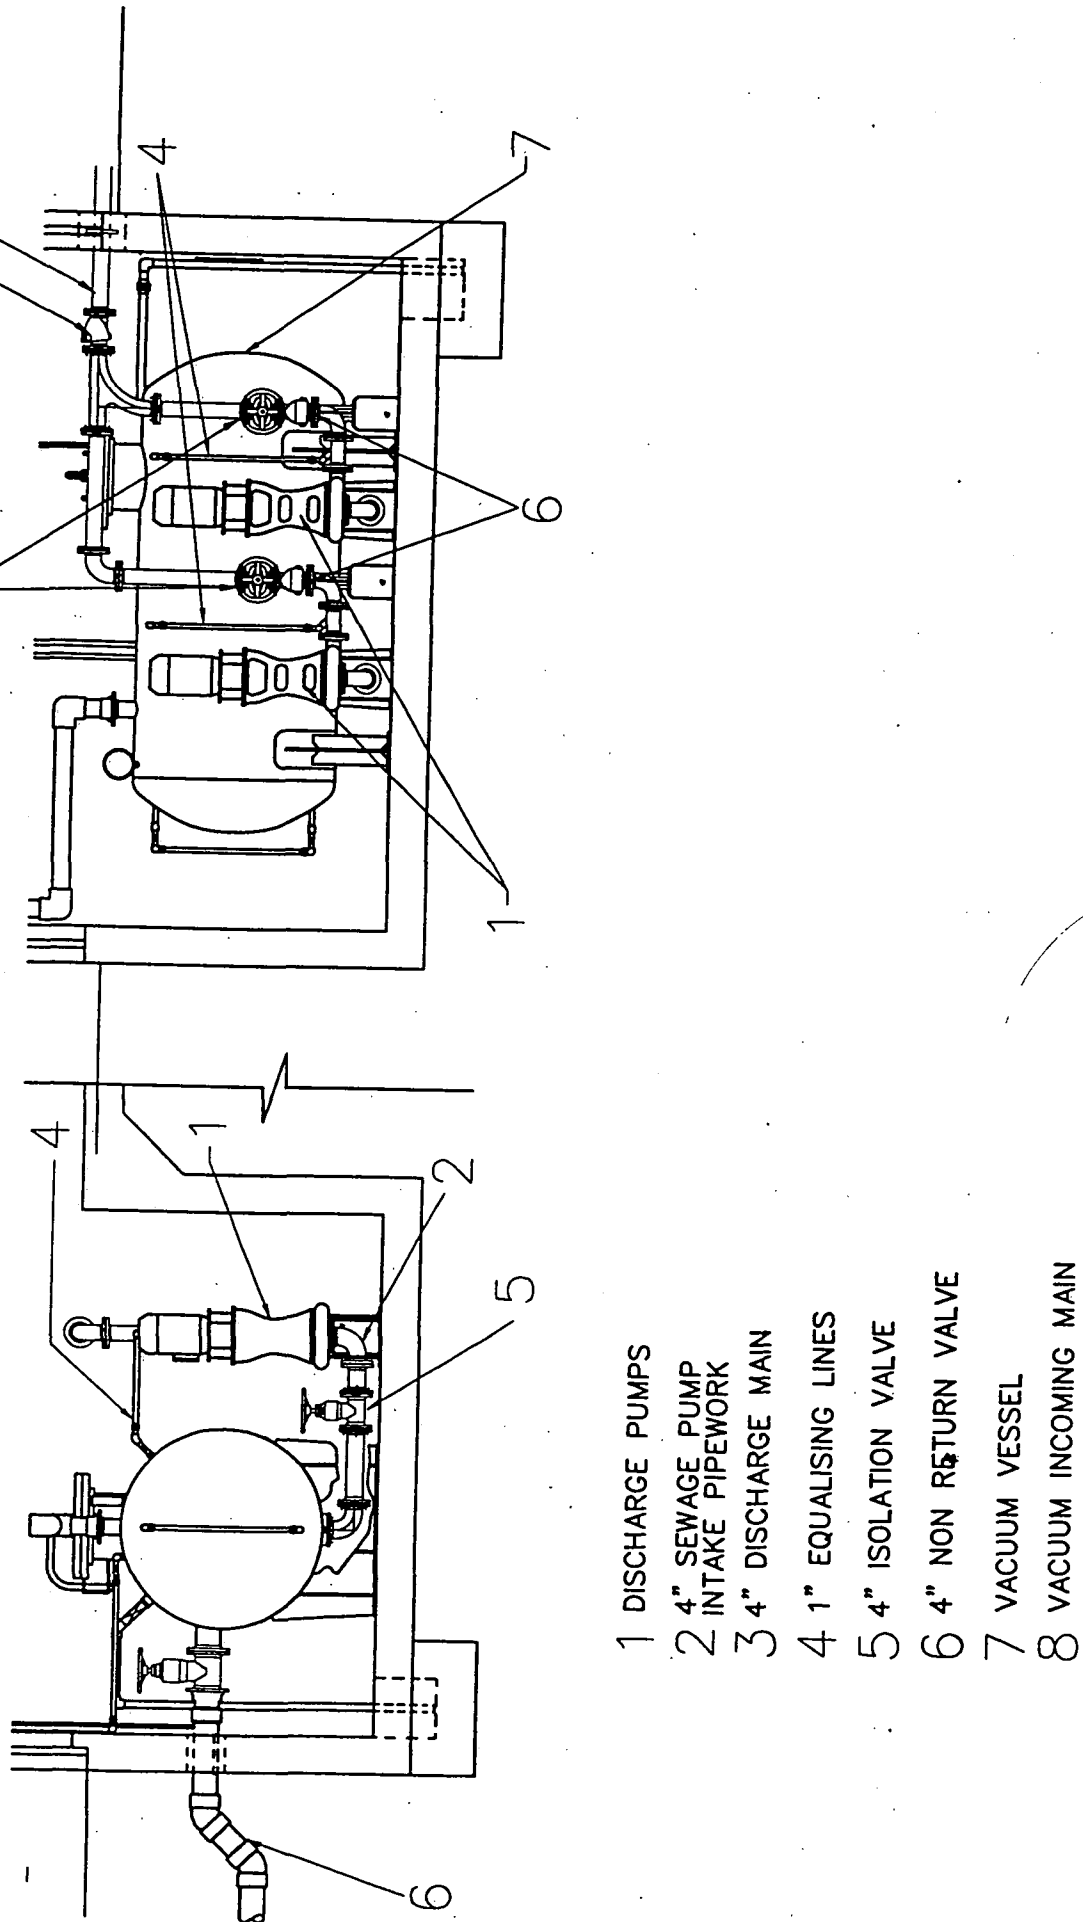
DISCHARGE PUMPS WITH TYPICAL PIPING ARRANGEMENT.
